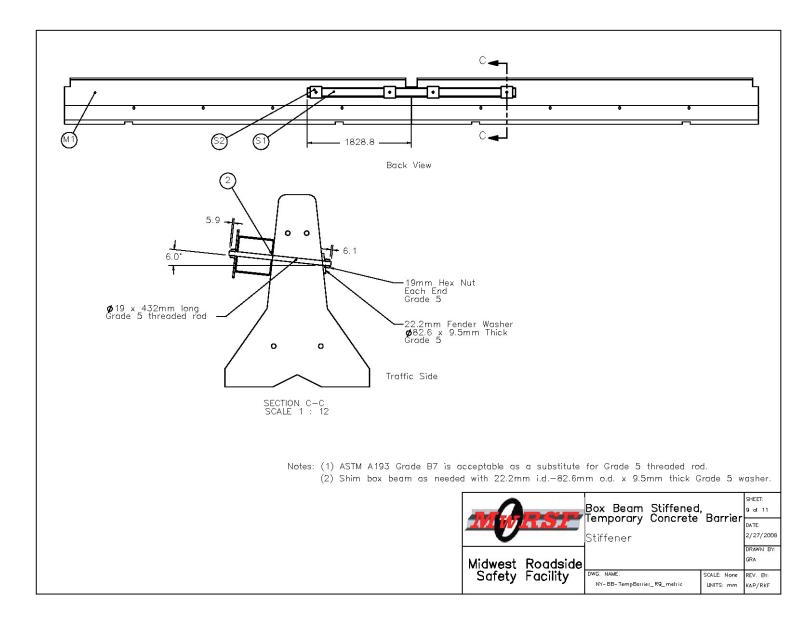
Box Beam Stiffener Details, Test NYTCB-1
